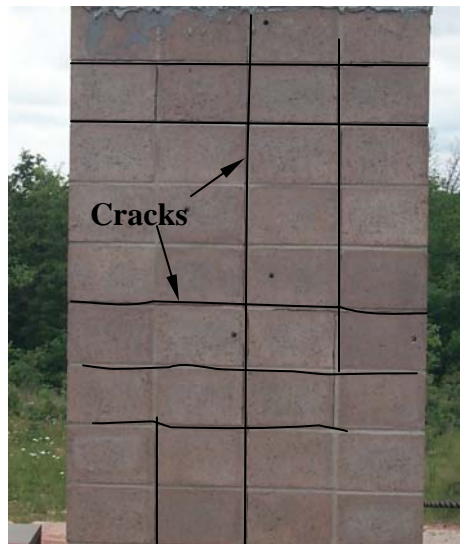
Cracks at Front Face of Wall A1 after Event #6
